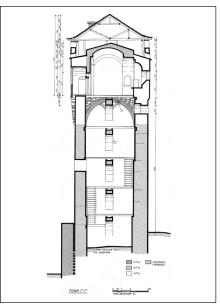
Tower of St Sava. Cross section (P. Androudis)
